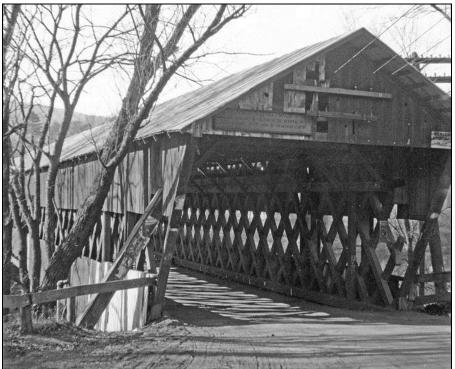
Ledyard Bridge, built 1859, showing New Hampshire portal in 1922 (Storrs 1922).
